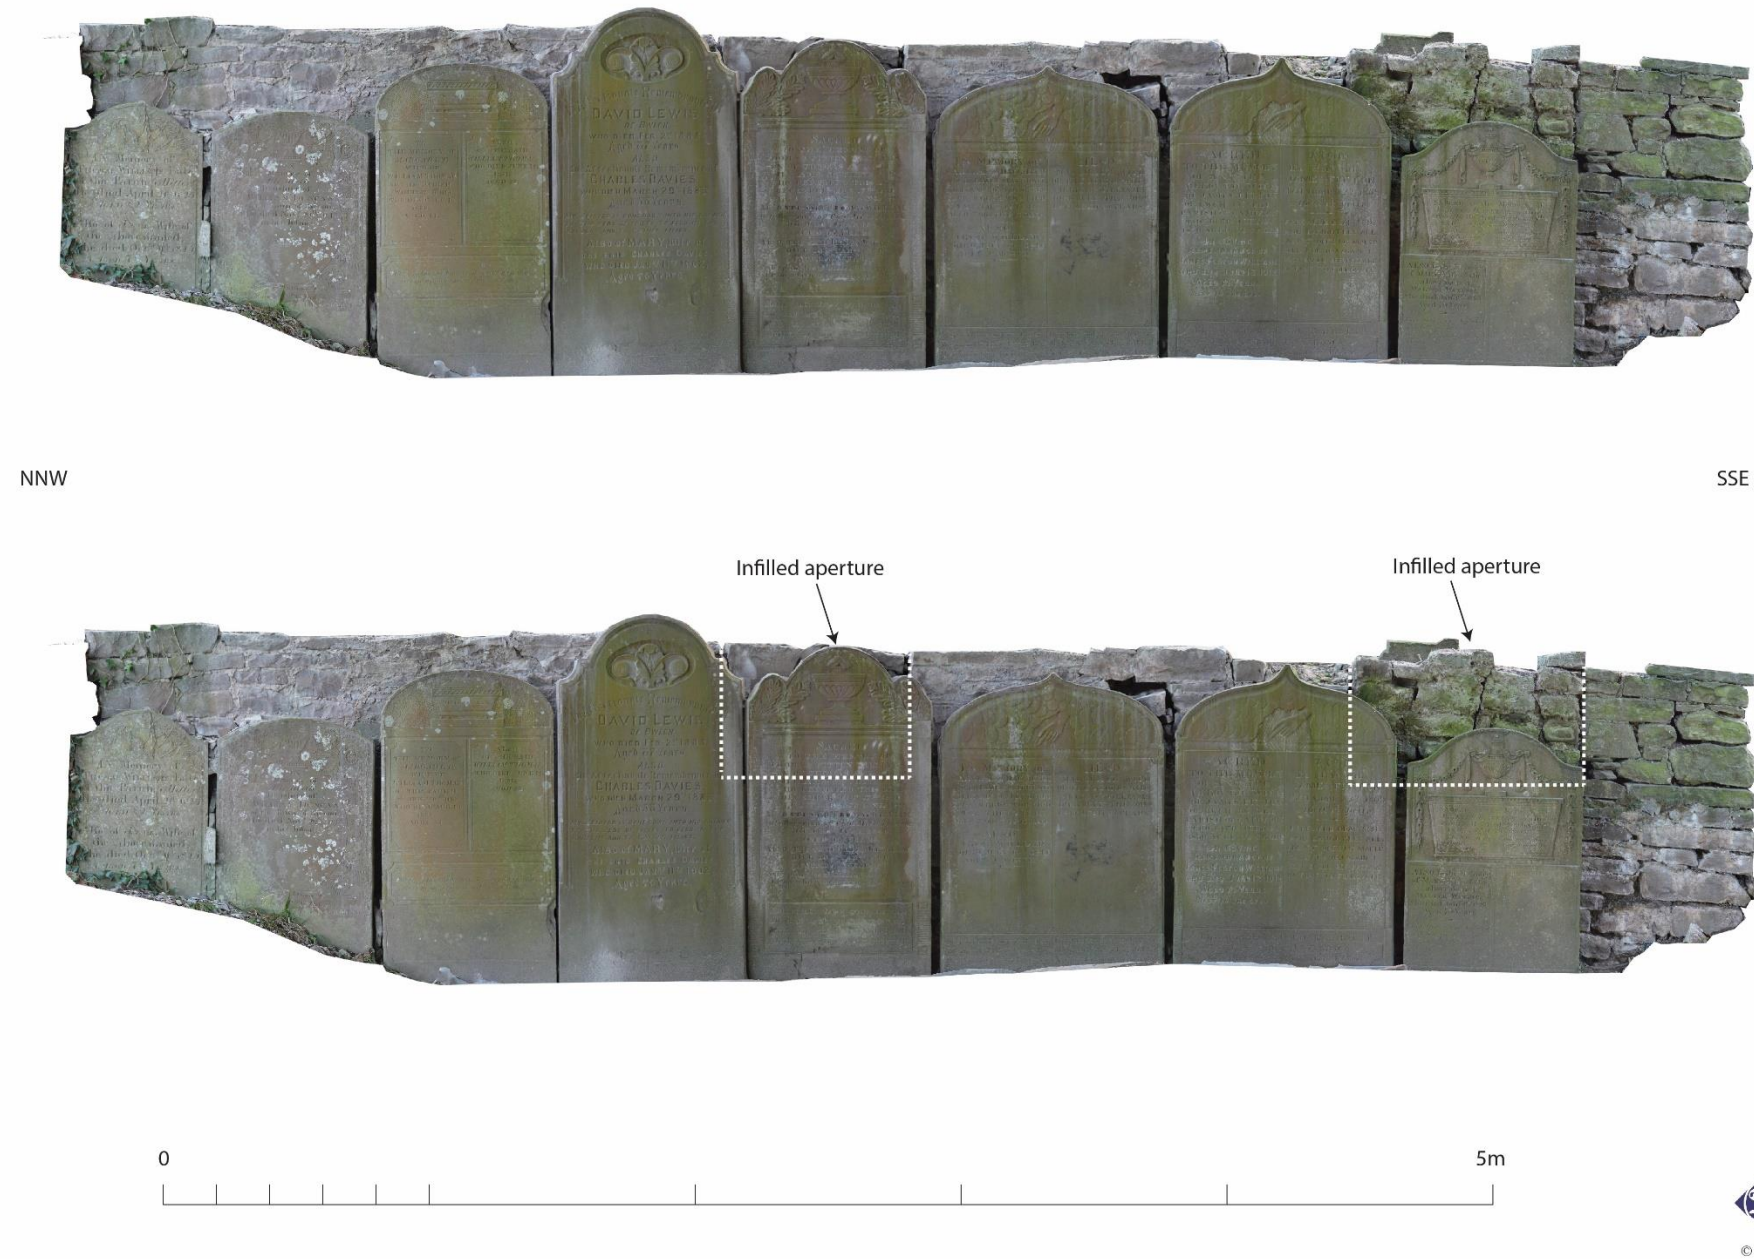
South south-west facing elevation of building on eastern boundary of churchyard and grave stones
